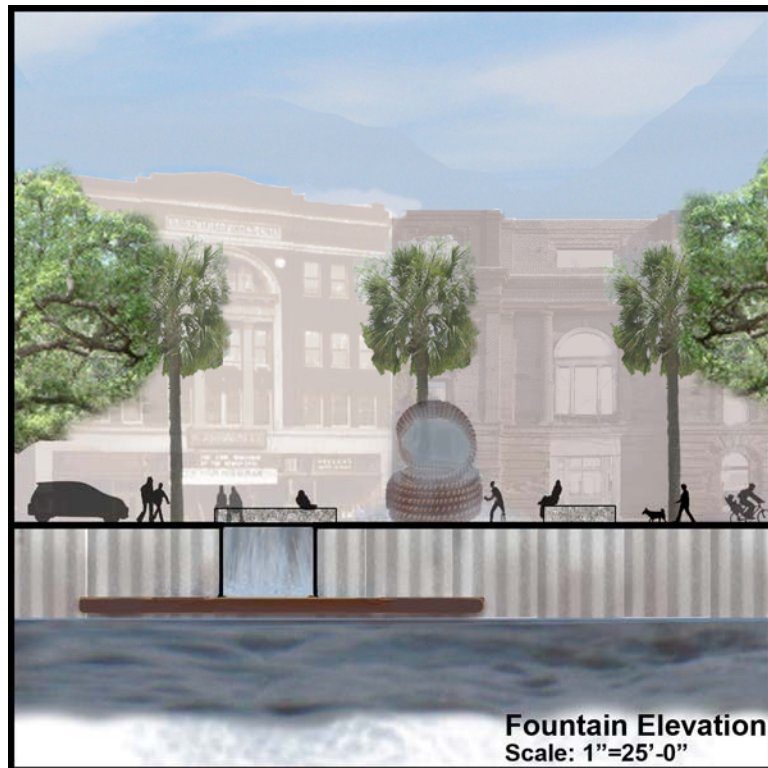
Illustrative section elevation looking northeast toward Sweetgrass Fountain from the Ashley River.
